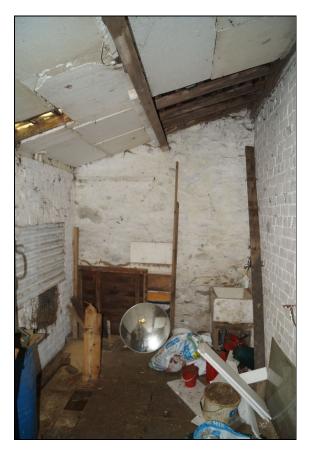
GGN2019_008 - A view of the inside of the "stable" which was probably the potting shed attached to the northern side of the building when it was in use as a glasshouse. The original stone floor appears to be in place. Looking east.
